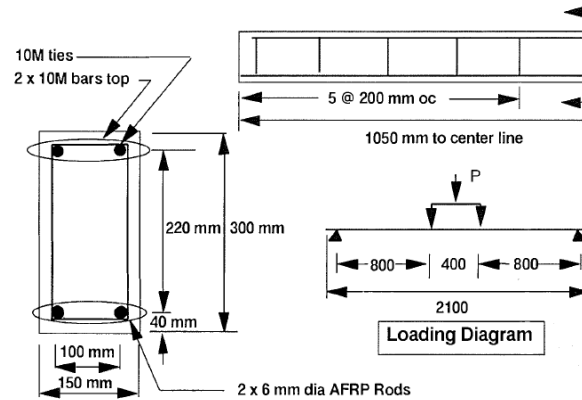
Dimensions and loading pattern for concrete beams (McKay 1992)
